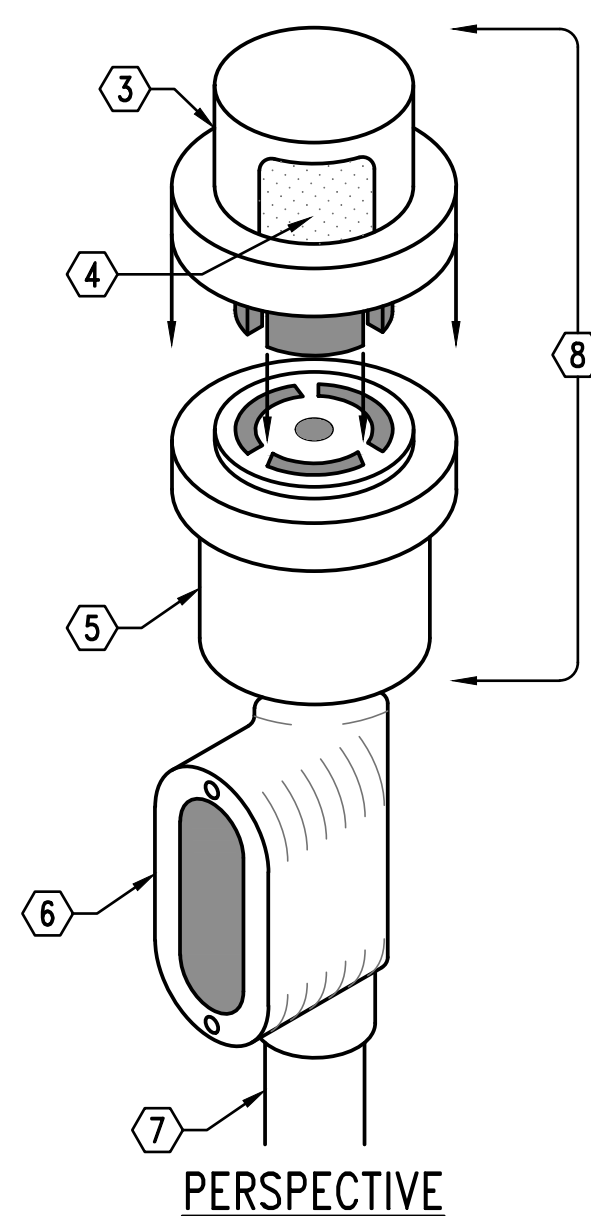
DETAIL - TYPICAL LAY-IN FIXTURE INSTALLATION
